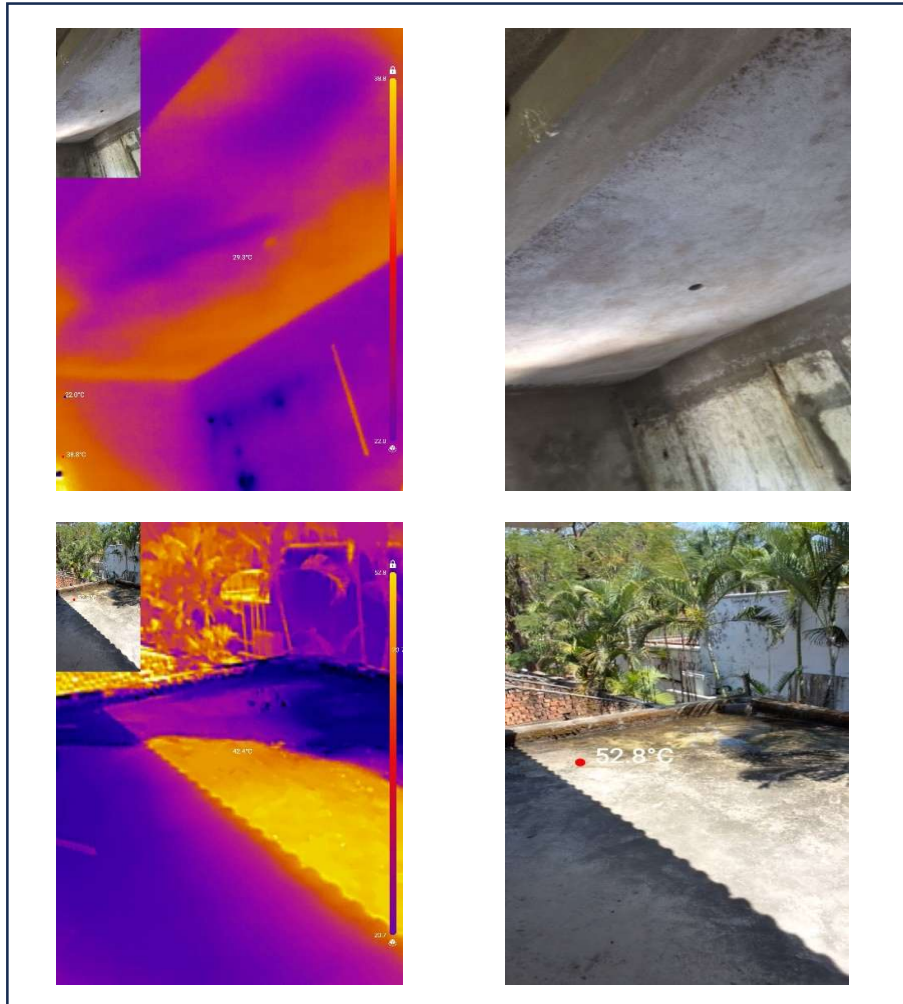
Water stagnation on the slab due to improper slope has resulted in penetration of water through electrical conduits and seepage into the slab soffit along the conduit path. -2nd floor
